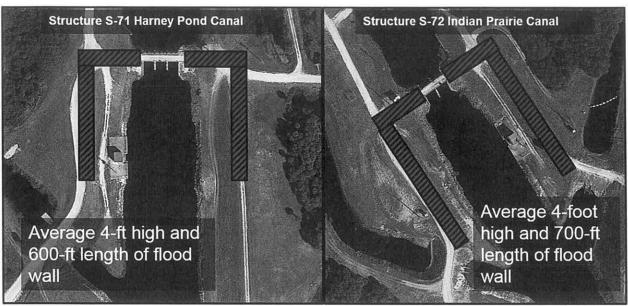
HHD Common Inundation Zone D proposed flood wall.
